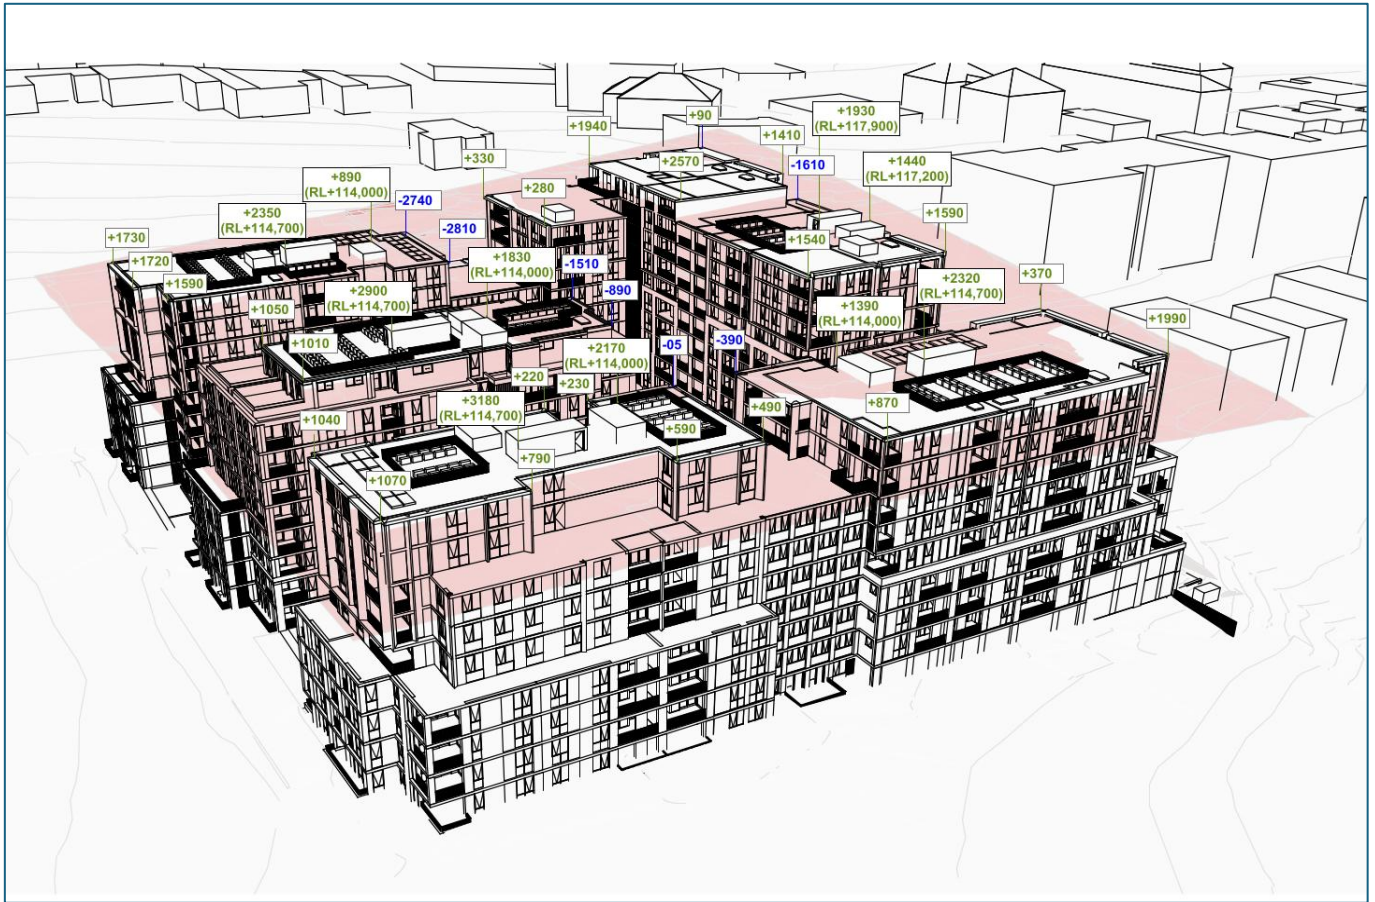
| Rooftop elements of Buildings 1, 2 & 3 protruding above the maximum permissible height plans (Source: RtS)
